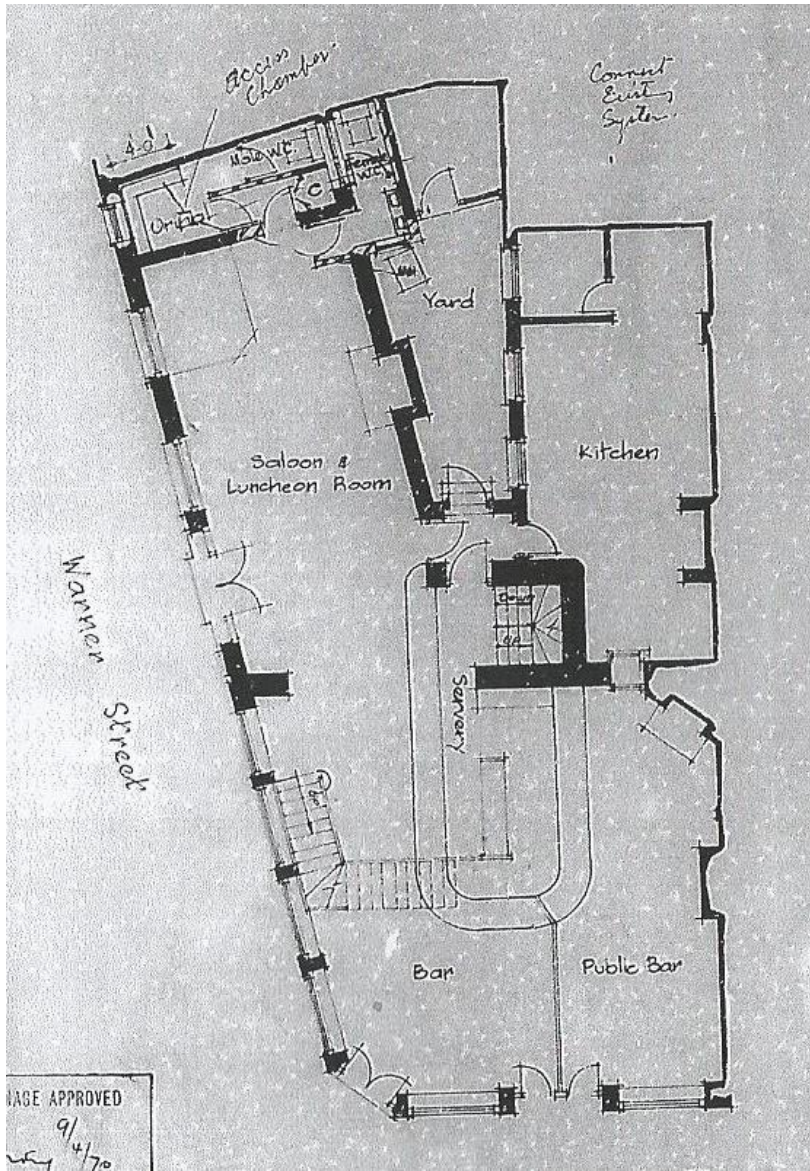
Ground-floor plan, 1970, showing alterations to the lavatories area.
